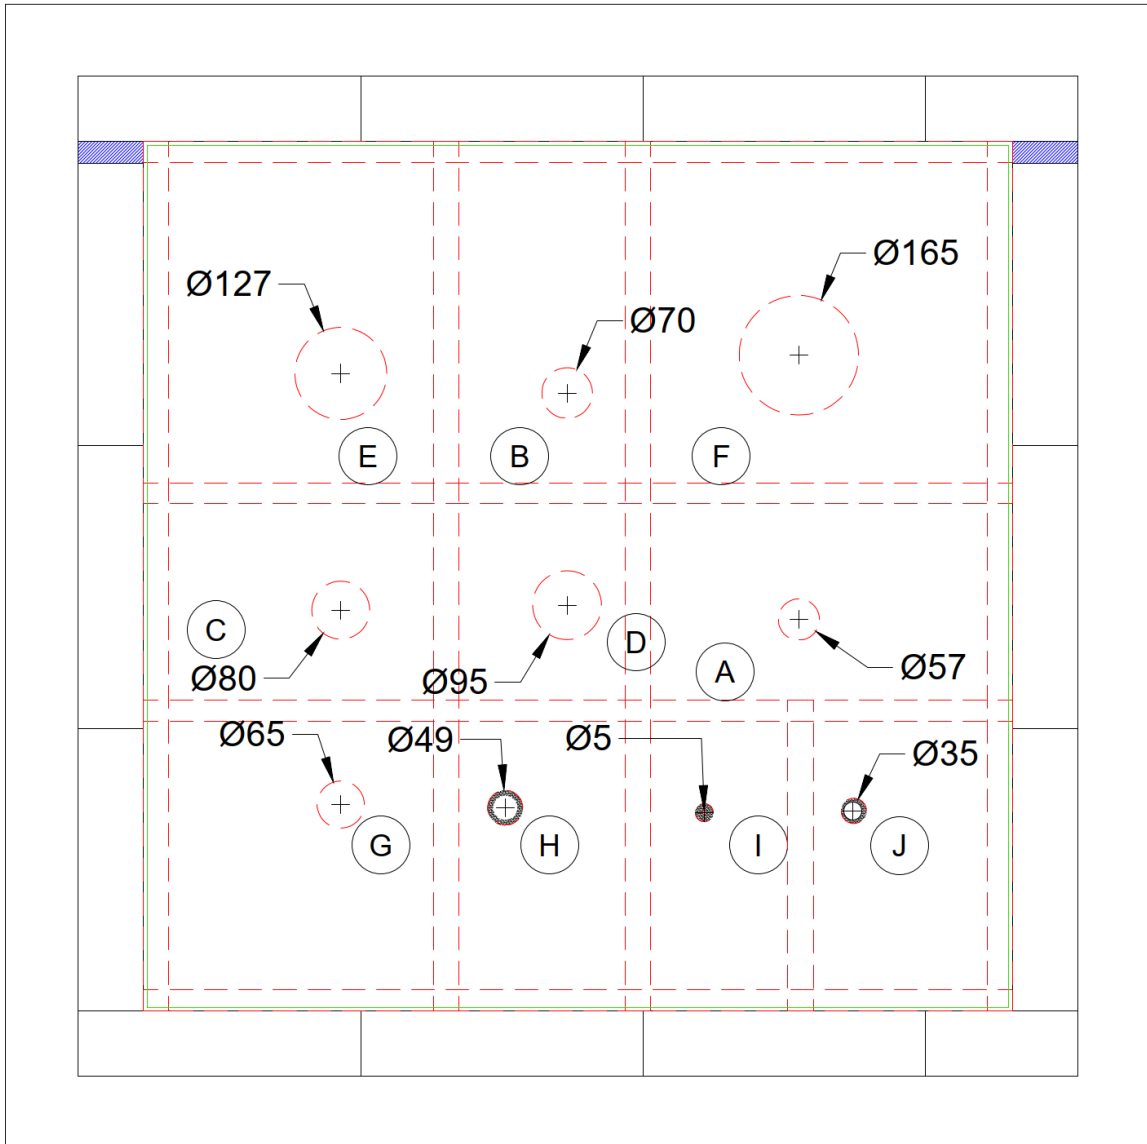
Elevation view of aperture sizes of the test specimens (unexposed side)
